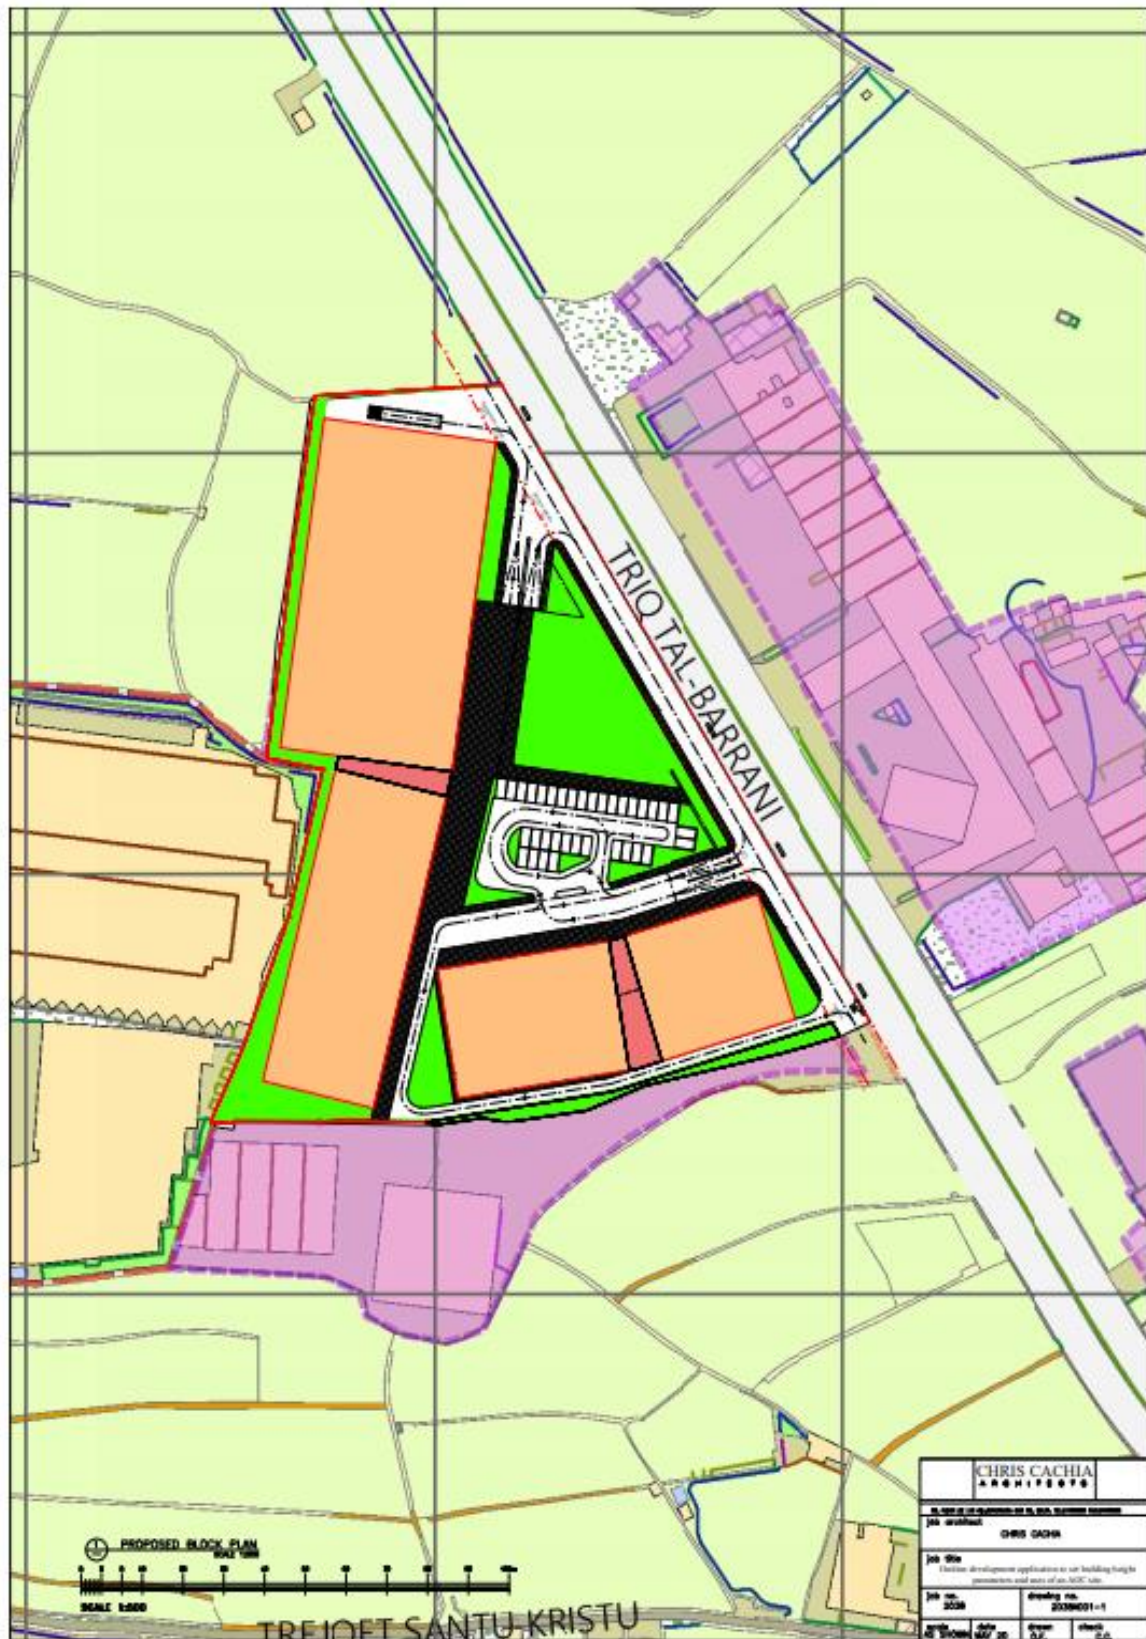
The proposed Block Plan. (Source: E-apps PA/05152/20/1g)
